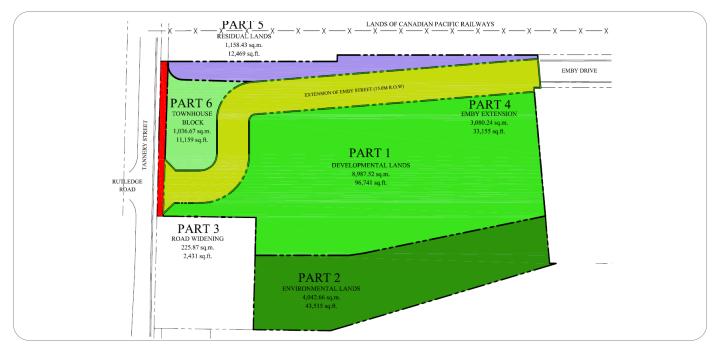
Context Area Plan: Prepared by Kirkor Architects
